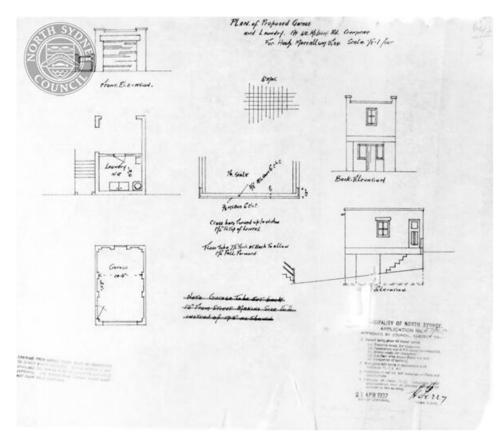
Building Application 37/105, 42 Milson Road Cremorne (Source: Stanton Library). Staircase marked with arrow.
